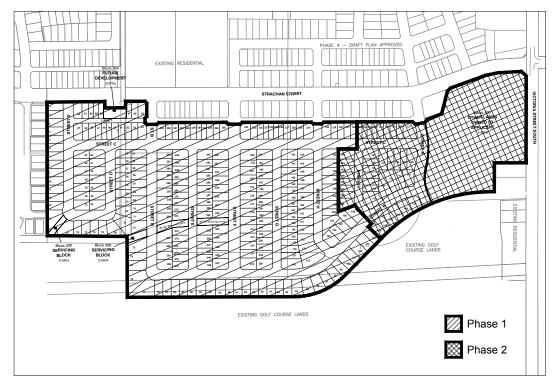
Revised Draft Plan of Subdivision (May 2020)
